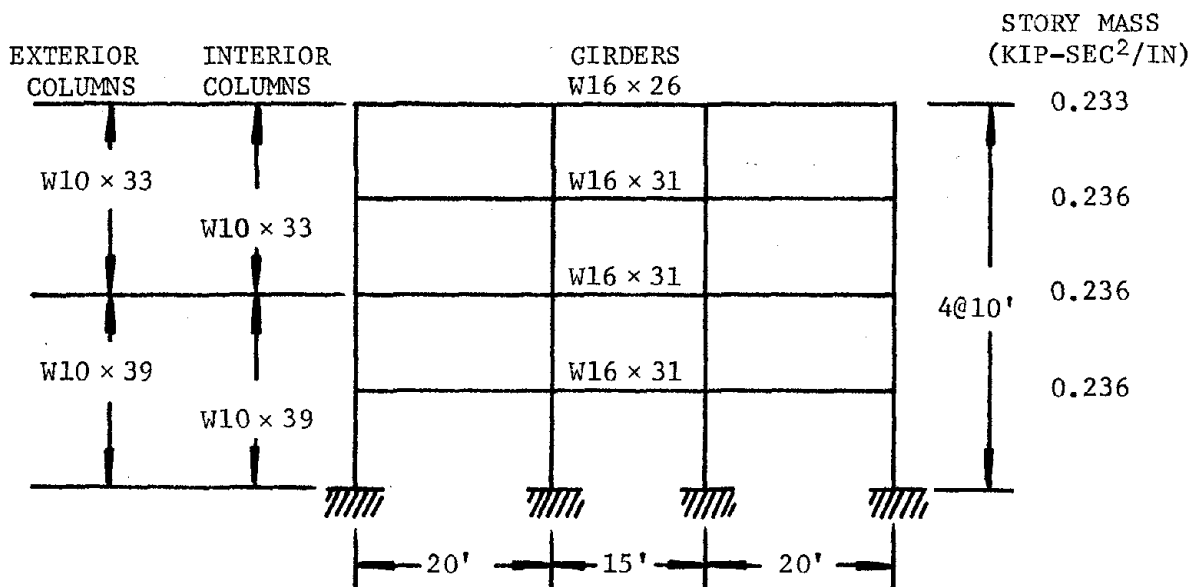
4-STORY STEEL FRAME ELEVATION [PIQUE, 49]
